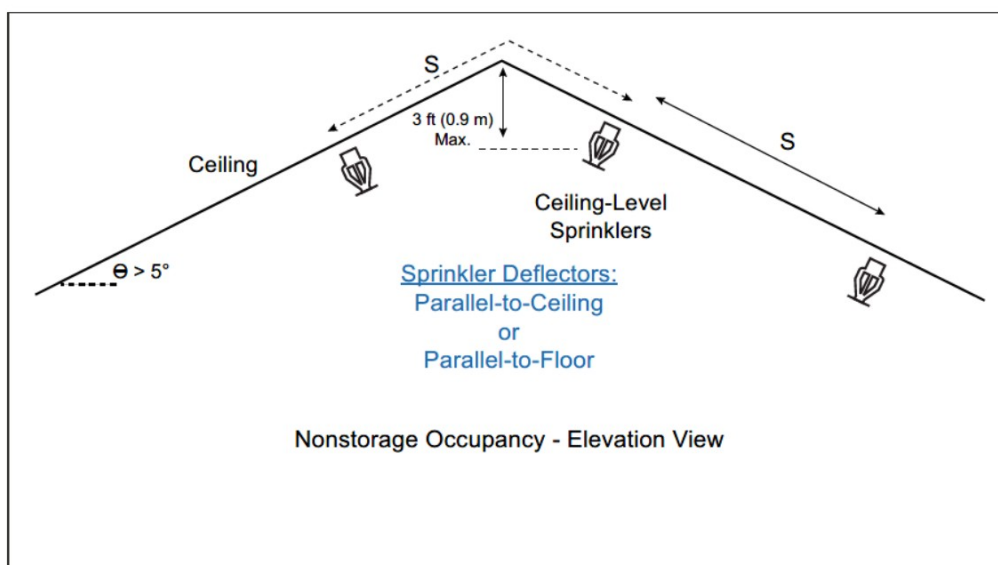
(b). Location of Nonstorage pendent and upright sprinklers near ceiling peak when slope exceeds 1 in 12 (5°)
